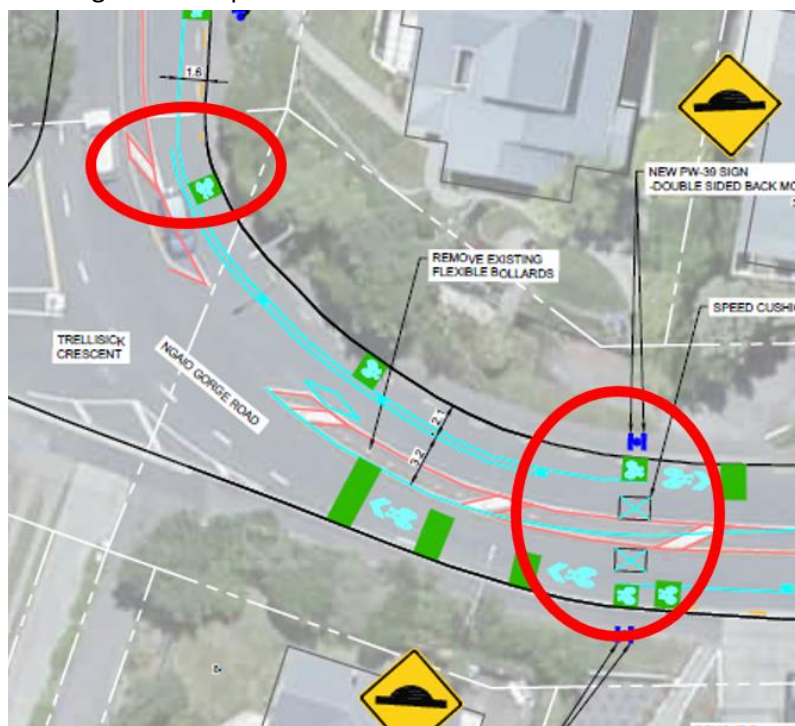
Ngaio Gorge Road General arrangement plan sheet 8 extract
